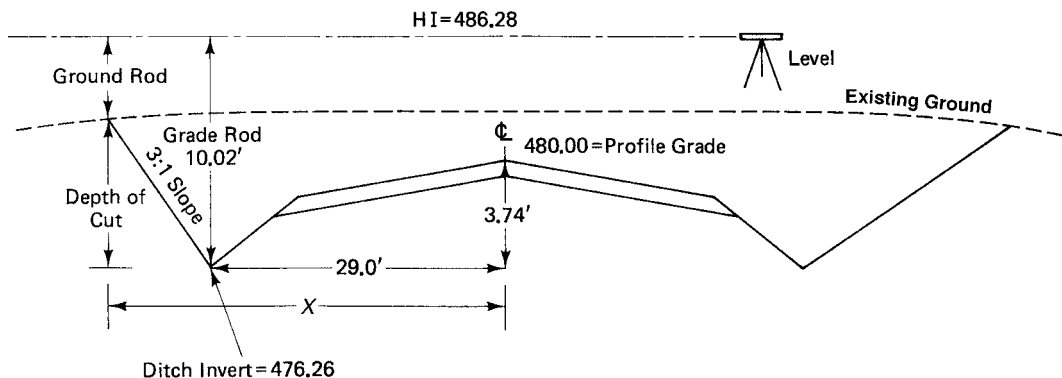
Location of slope stake in cut section (Example 12.1).
